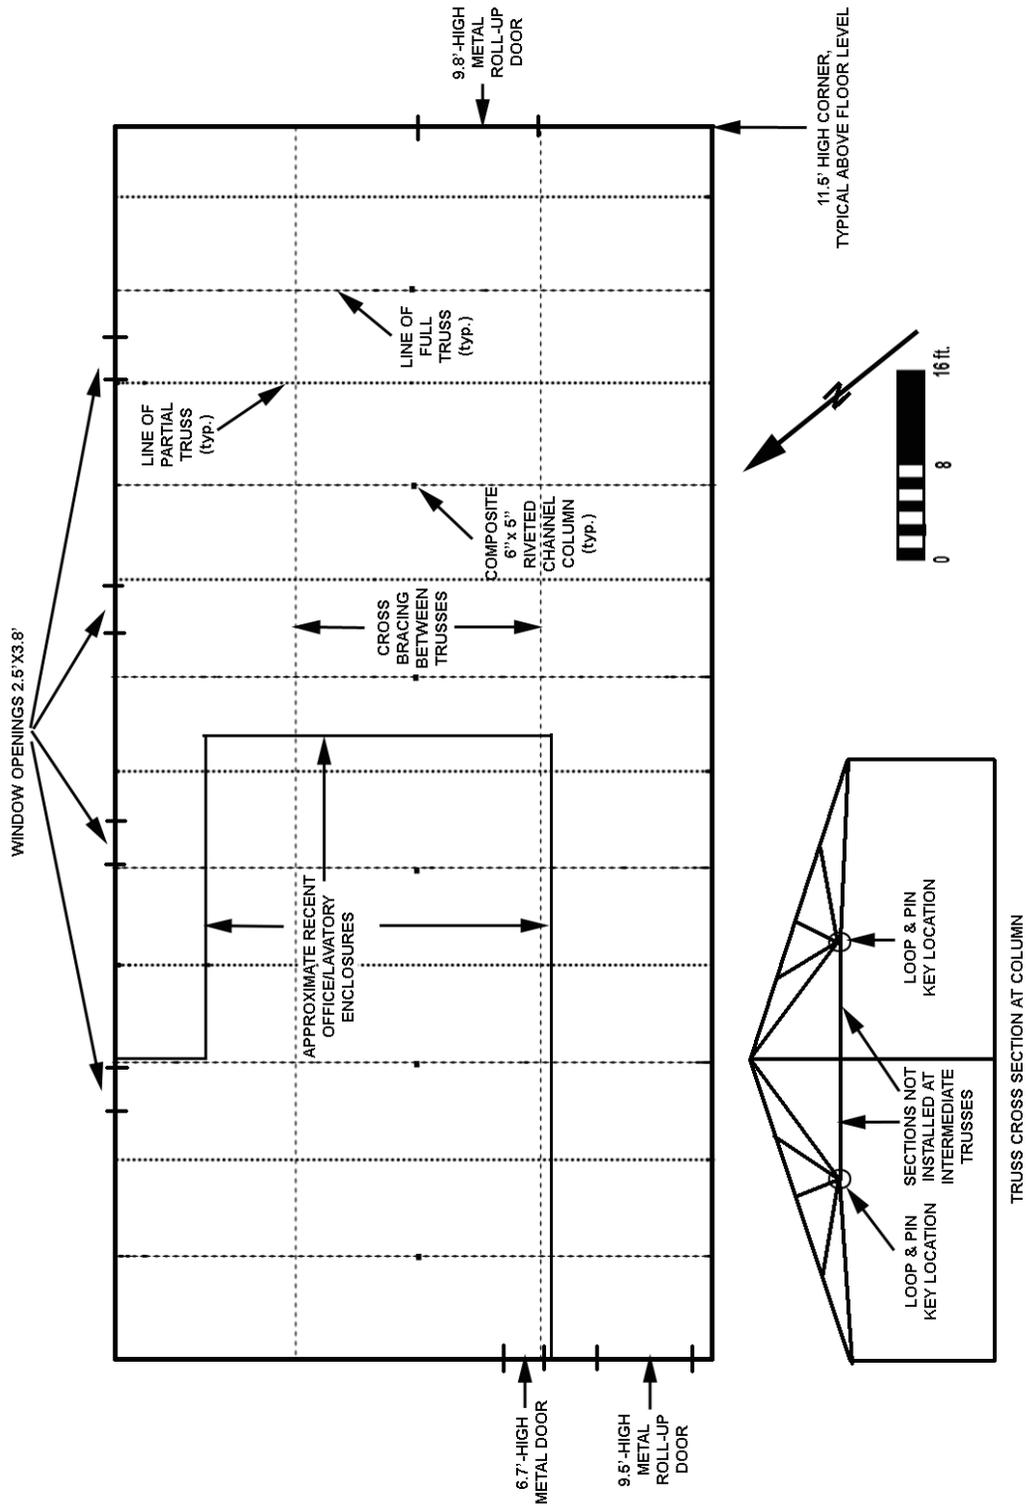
SKETCH PLAN AND TRUSS CROSS SECTION
